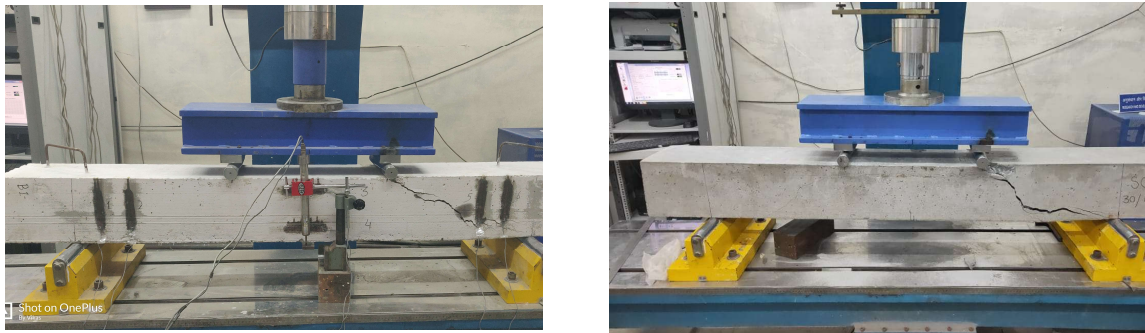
Failure pattern of reinforced concrete beams
